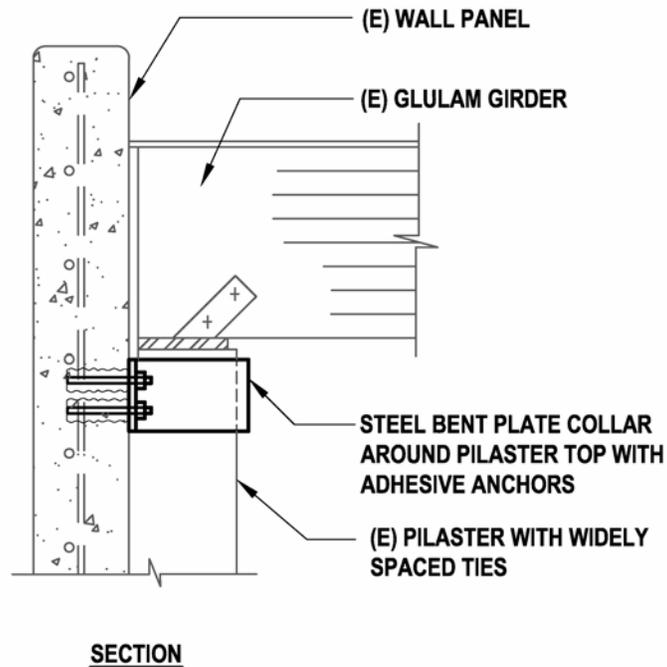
Enhanced Girder Connection – Collar at Pilaster
